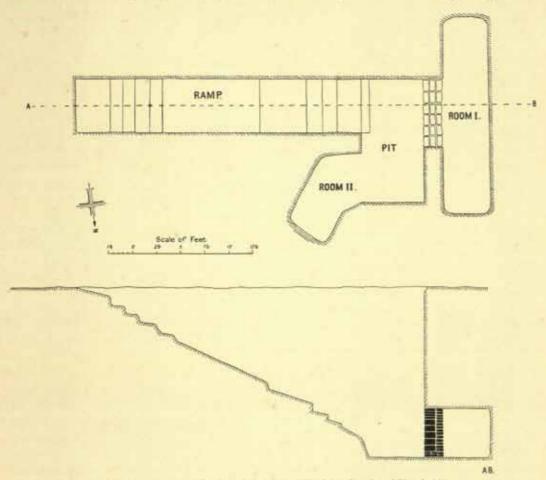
Plan, and Section through A-B looking South, of Tomb 12.
